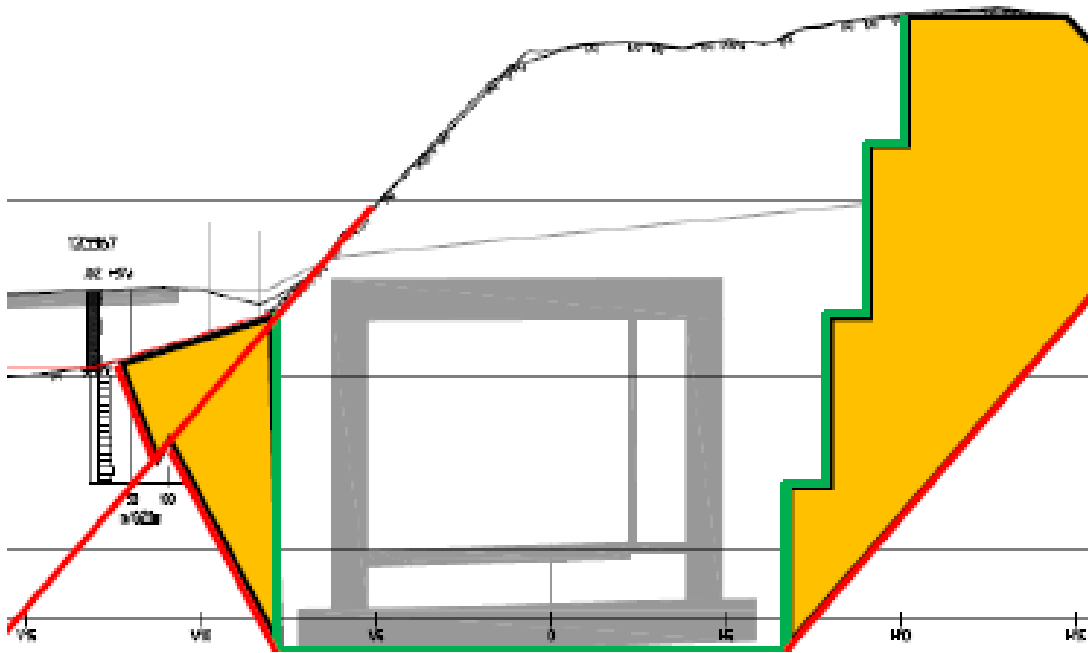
Section of an excavation in rock for a concrete tunnel showing how the potential slide volume rapidly increases with the height/depth of the cut. On the left side, toppling failure may also occur.
